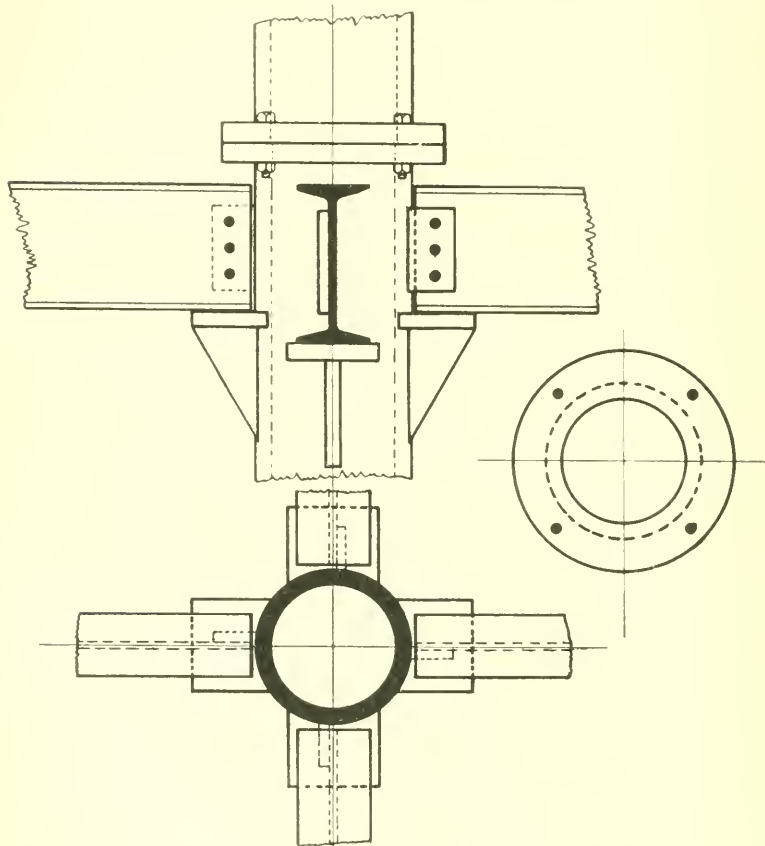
CONNECTION BETWEEN ROLLED BEAMS AND CAST-IRON COLUMNS.
